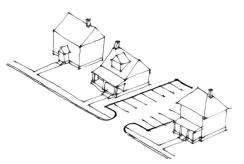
Parking lots should not extend to the sidewalk and be left unscreened.
